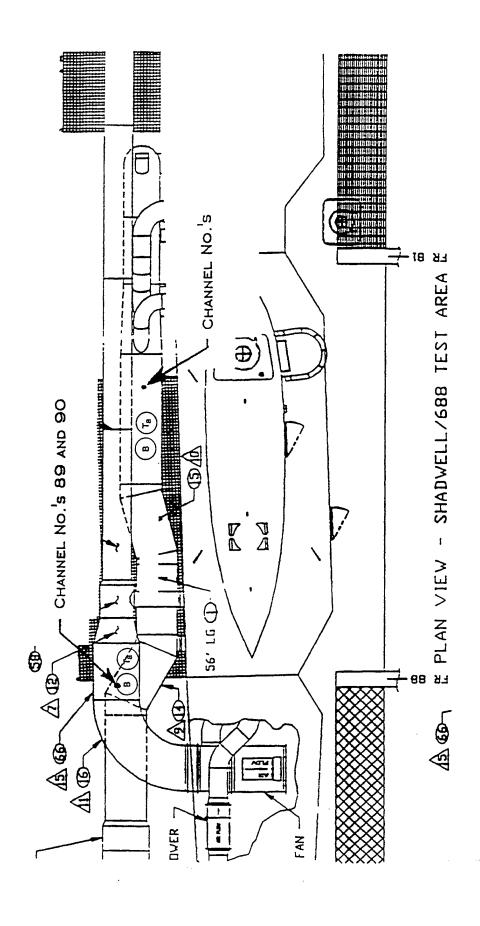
Supply and Exhaust Ventilation Ducting instruments
